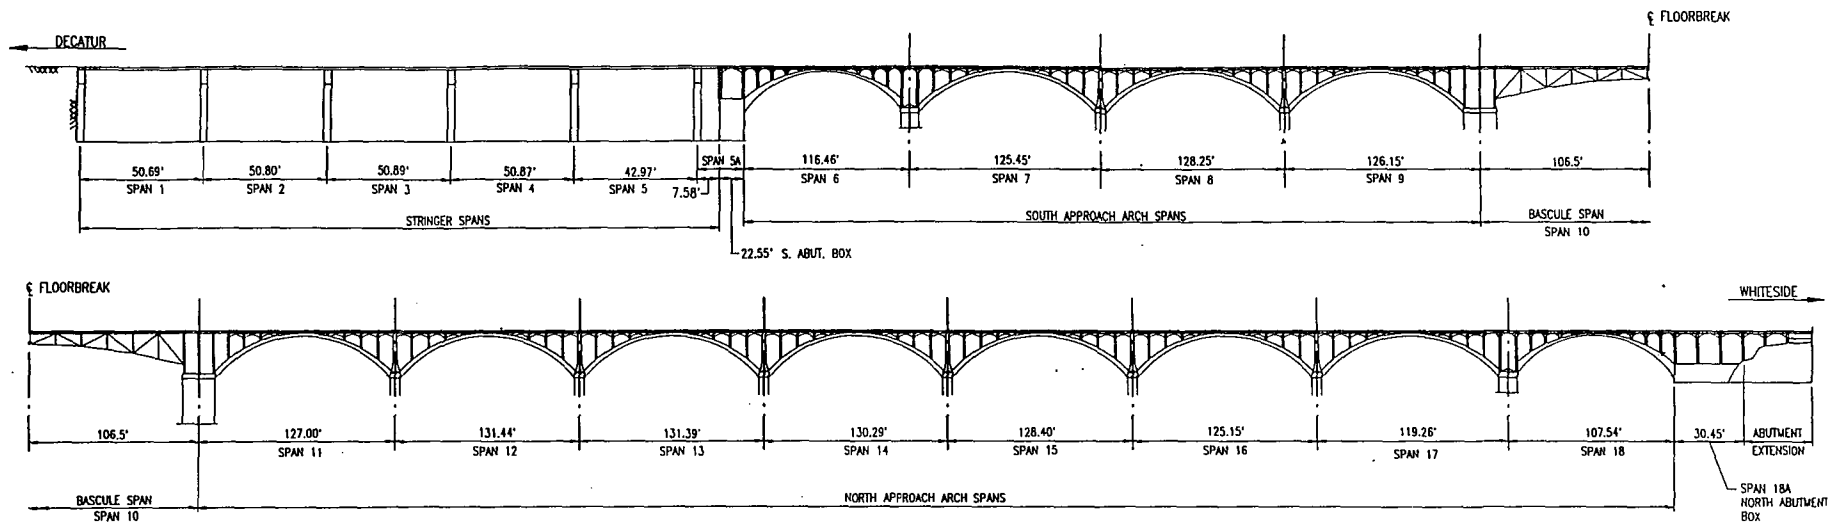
Elevation of Keller Memorial Bridge (003-52-021.9A)
